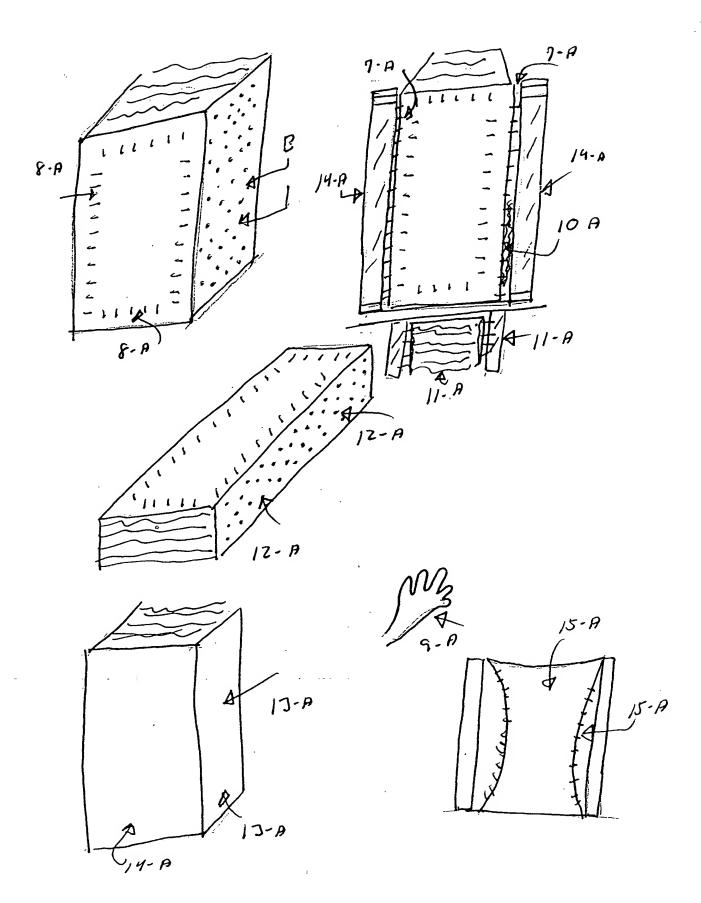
Full flanged tack insulation still sealed, and the tacks are not through the paper. Fig. 13-A.
